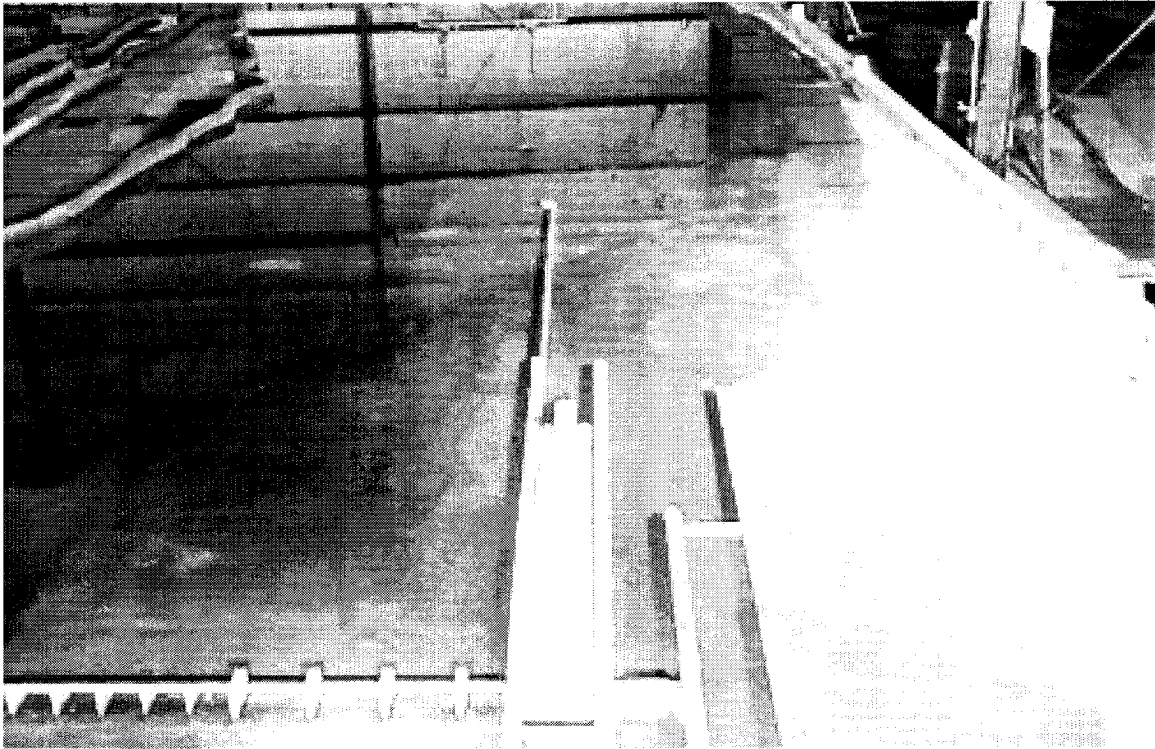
Lock Location 4 Plan A, looking downstream, showing lower lock approach
